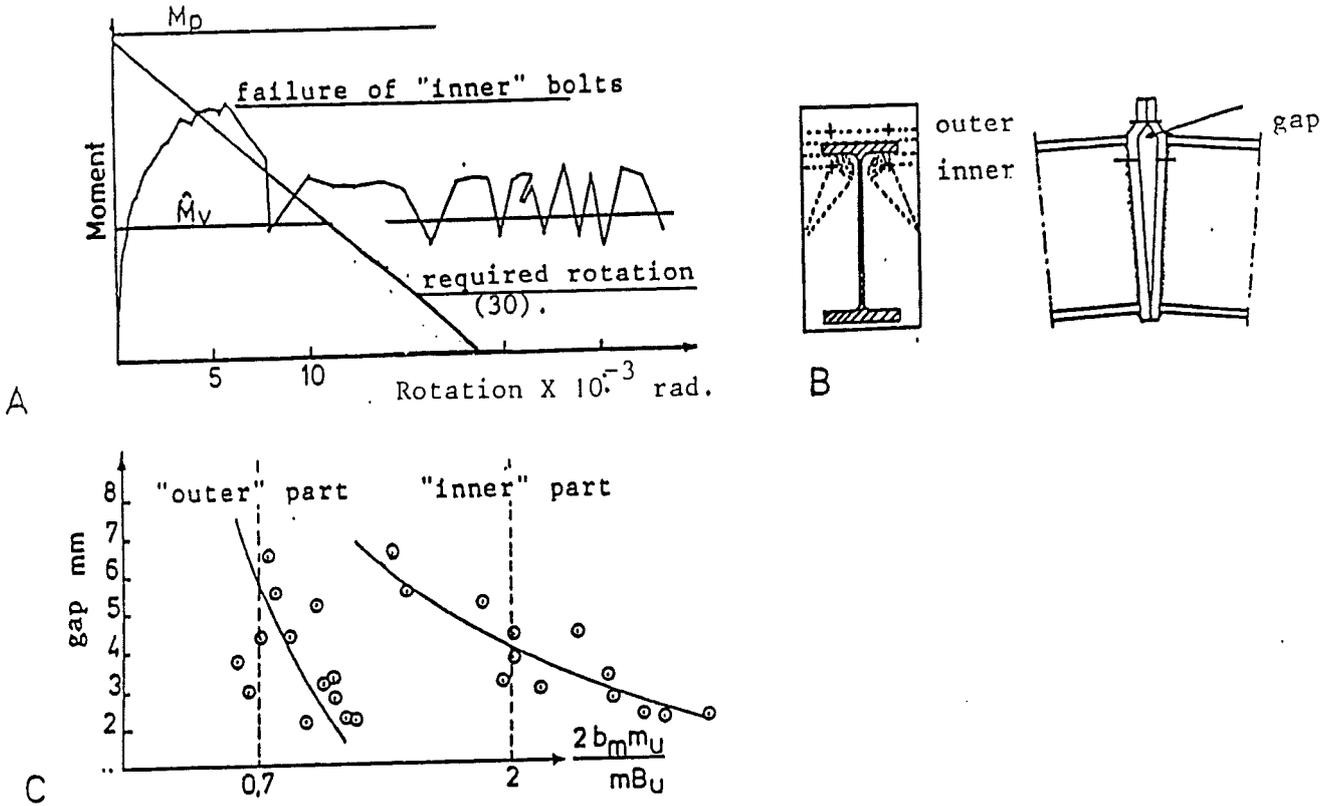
Explanation for premature bolt failure. For the part between the beam flanges: $\beta > 2$.
